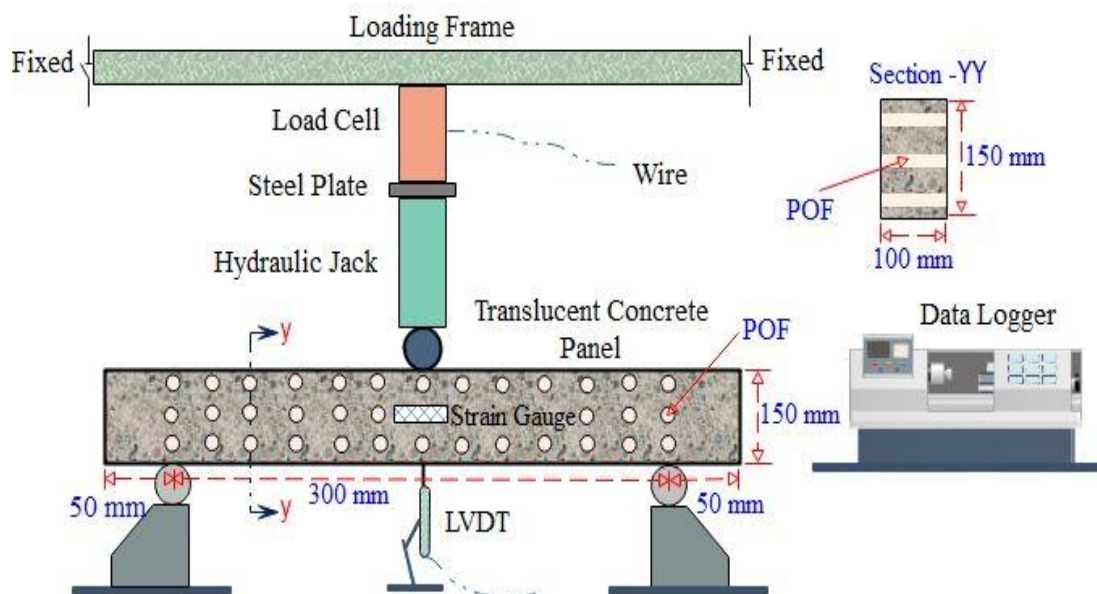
Setup detail for structural performance of translucent concrete panel
